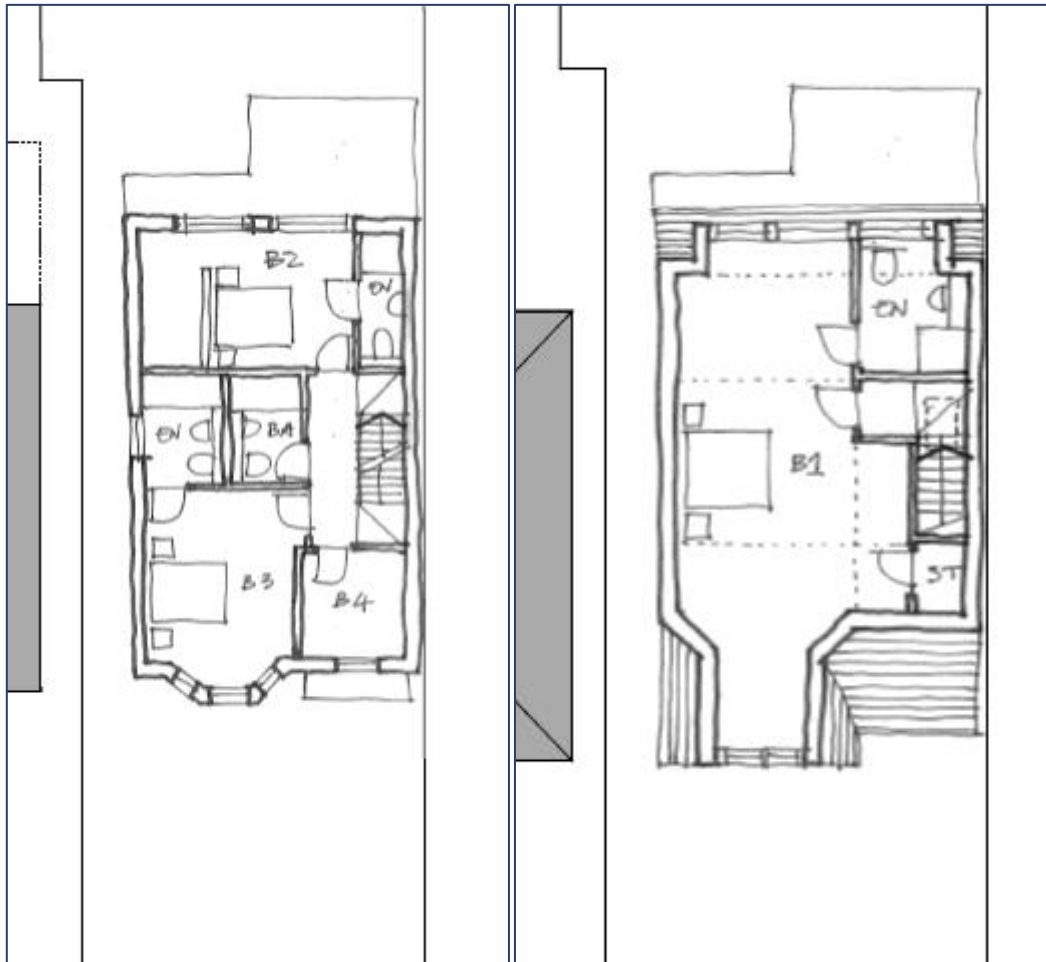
Proposed first (left) and second/roof (right) floor level plans
